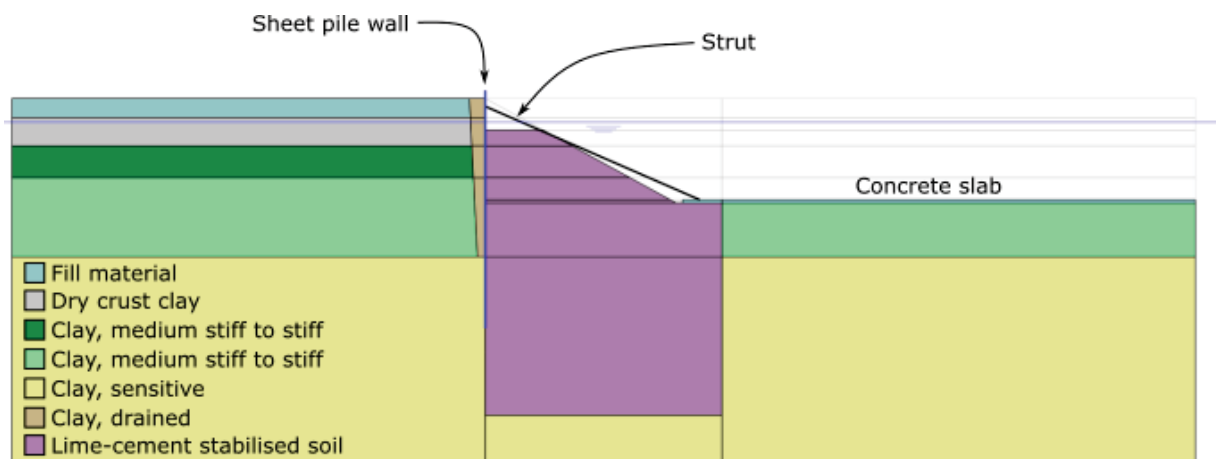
Geometry of the Plaxis 2D model of the sheet pile wall and excavation pit of phase 6, where the main excavation is performed and the concrete slab and struts installed.
